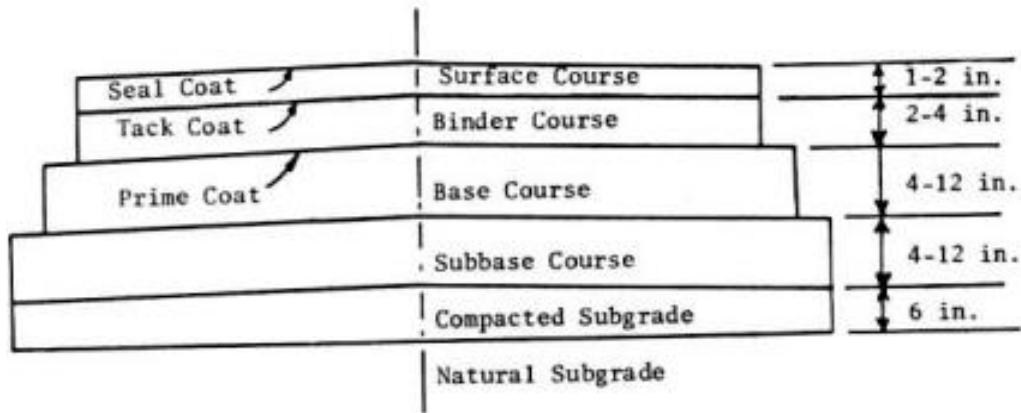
Typical pavement structure (Ordonez, 2006)
